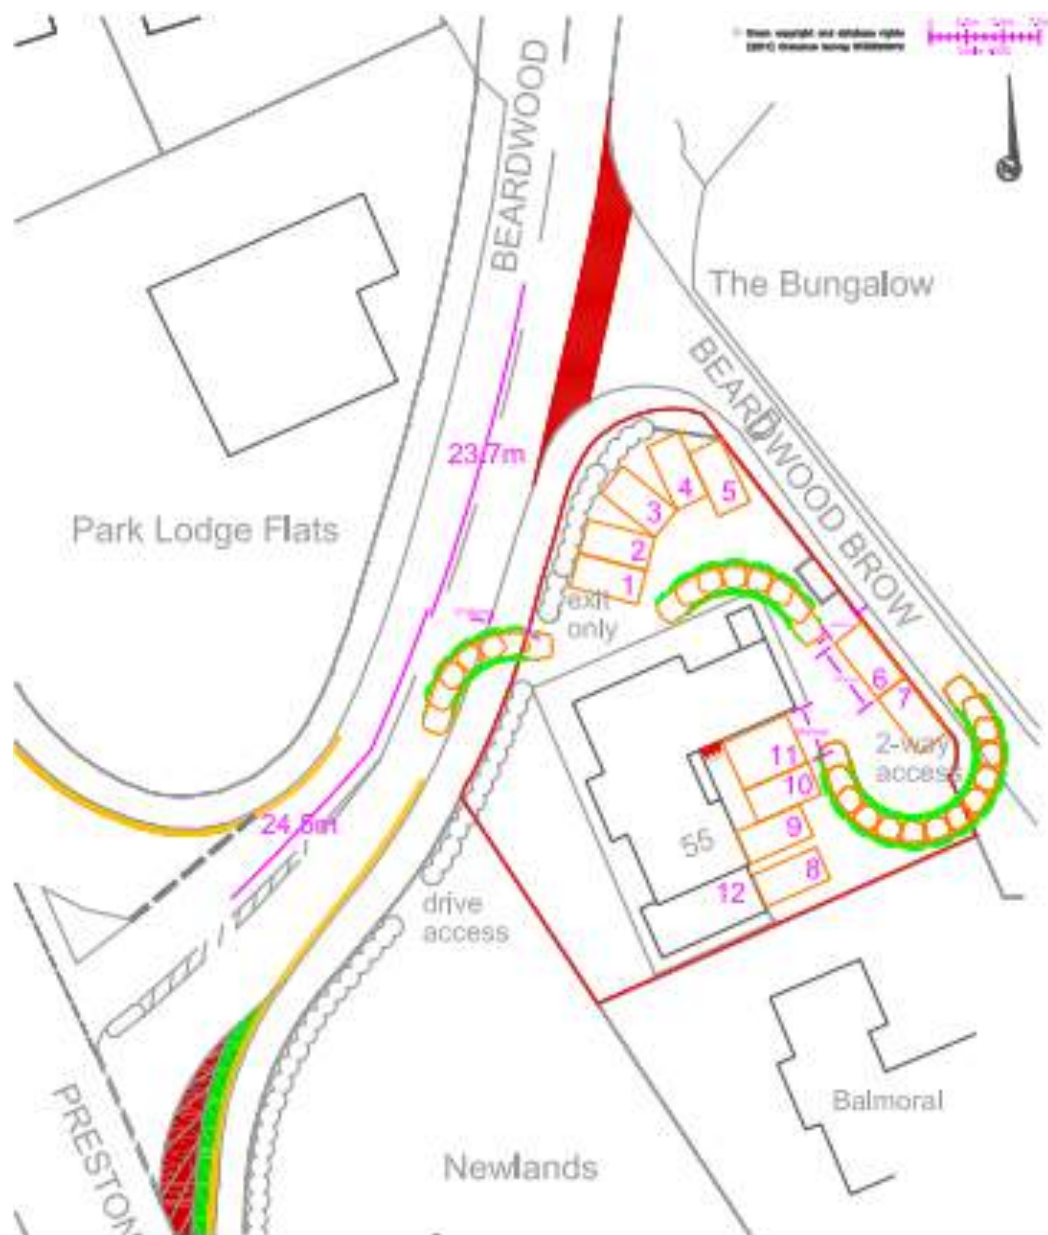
Proposed Parking/Access Plan Extract Source: AZH (not to scale)
